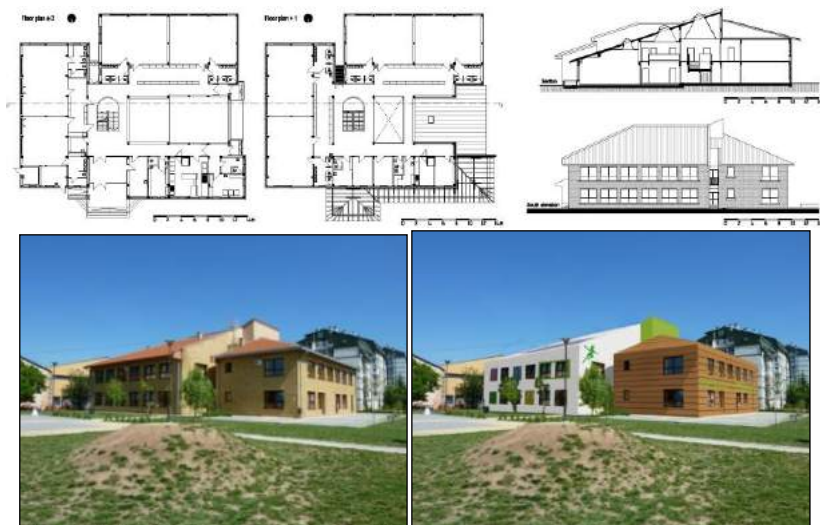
Floor plan, section and elevation of the “Petar Pan” kindergarten and proposed redesign
